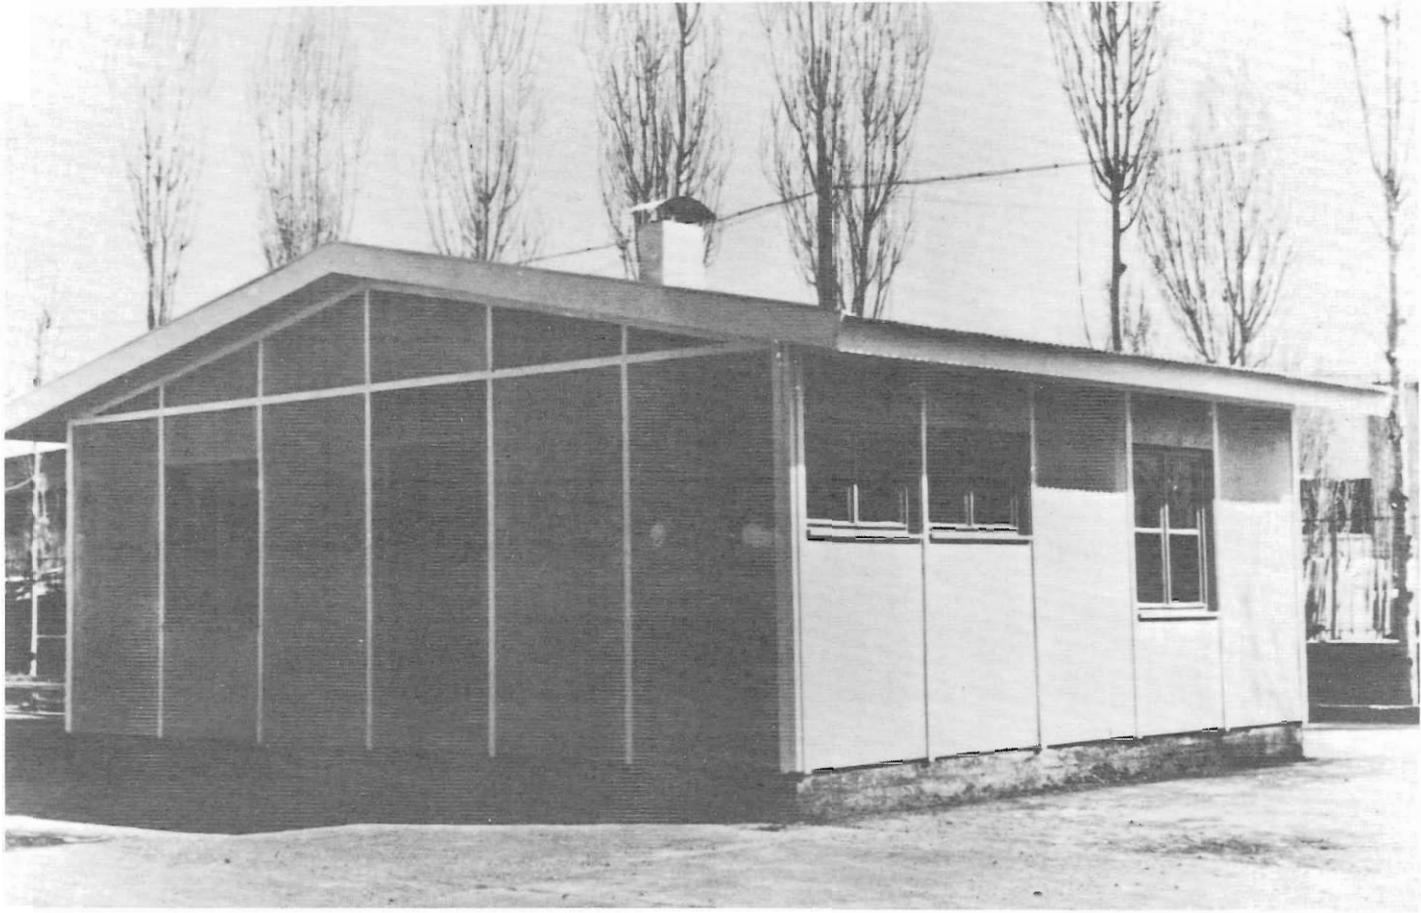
Timber-panel prefabricated house, Turkey. The principal materials used in this dwelling are plywood, asbestos, cement, wood (for frame and floor), corrugated metal. Excellent aseismic behavior of such units can be achieved through use of light materials, rational design of framing and of connections.
